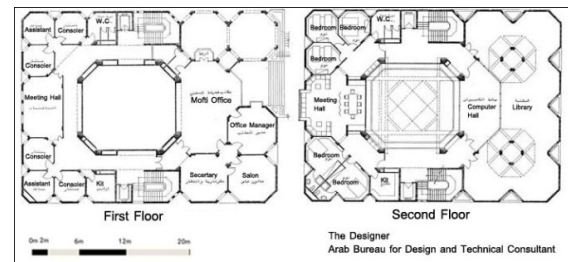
Design Elements of El Eftaa building at first and second floors. (DEE 1997)
